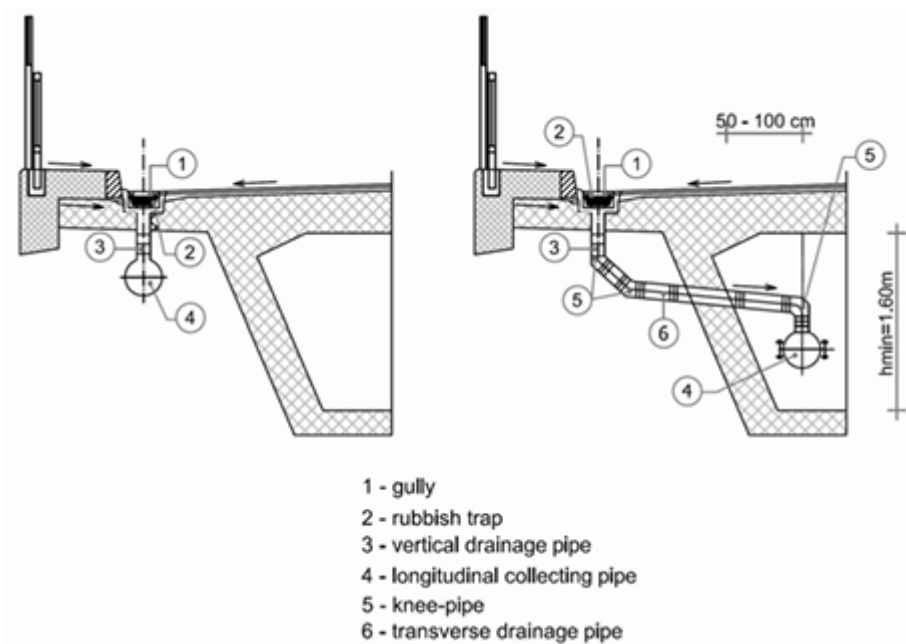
Methods of placing drainage elements outside and inside of box section
